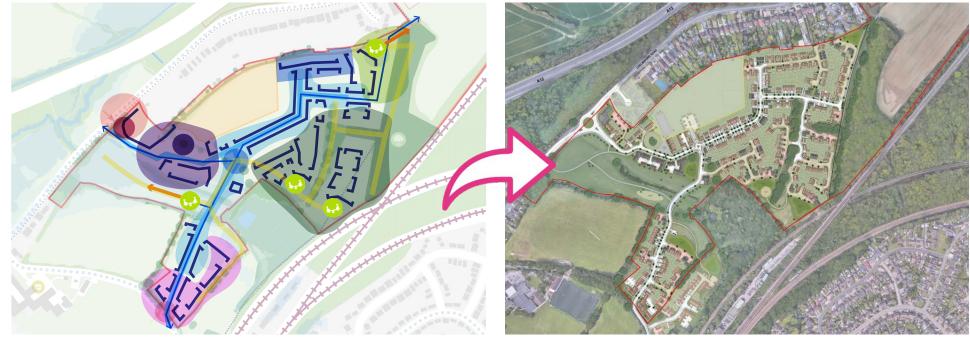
Developed Concept Plan Sketch Source: FINC Architects
